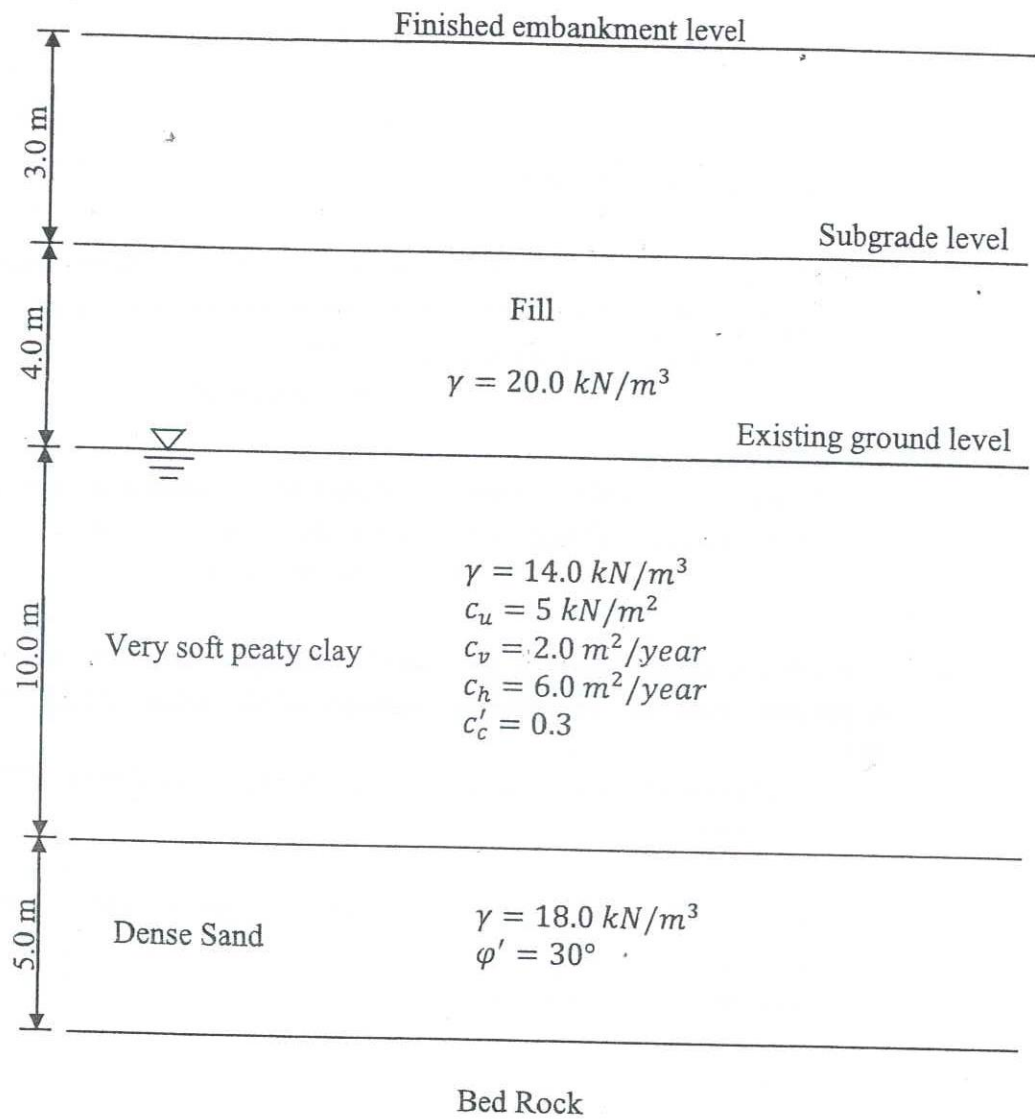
Cross section of the road embankment with sub surface soil profile
